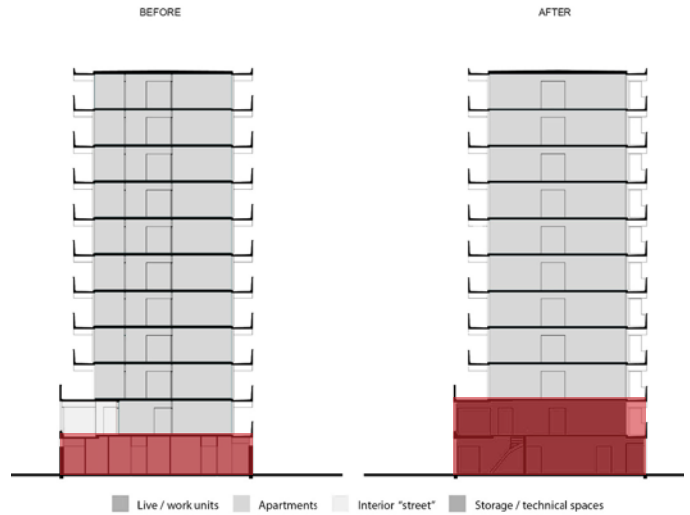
Diagram section, by NL Architects + XVW architectuur. [source: Archdaily]
